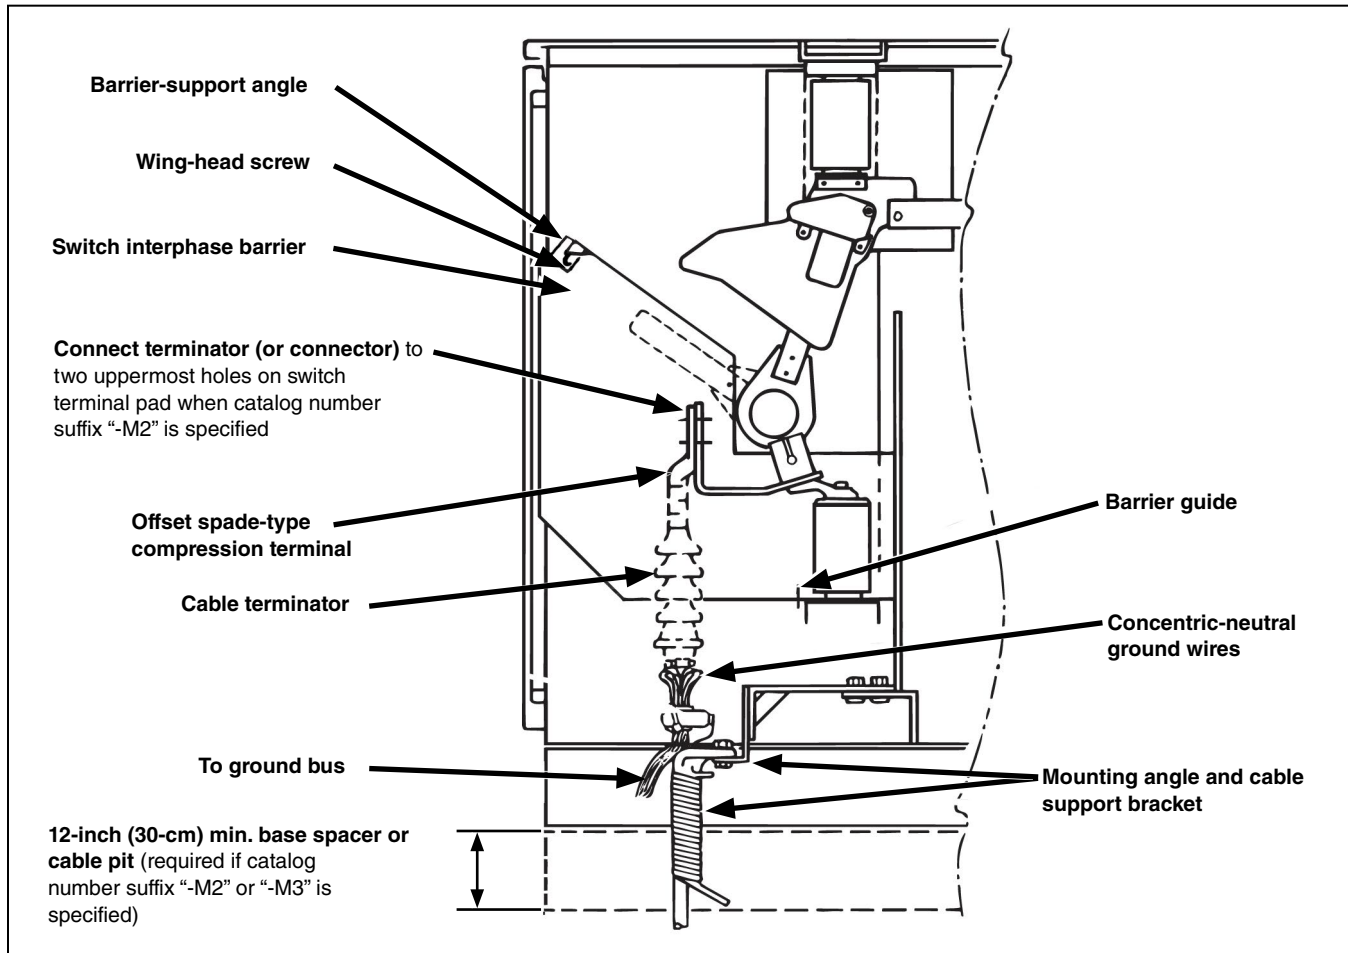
Side view of the switch showing the interphase barrier attachment points, terminal-pad connections, and optional cable guides.
